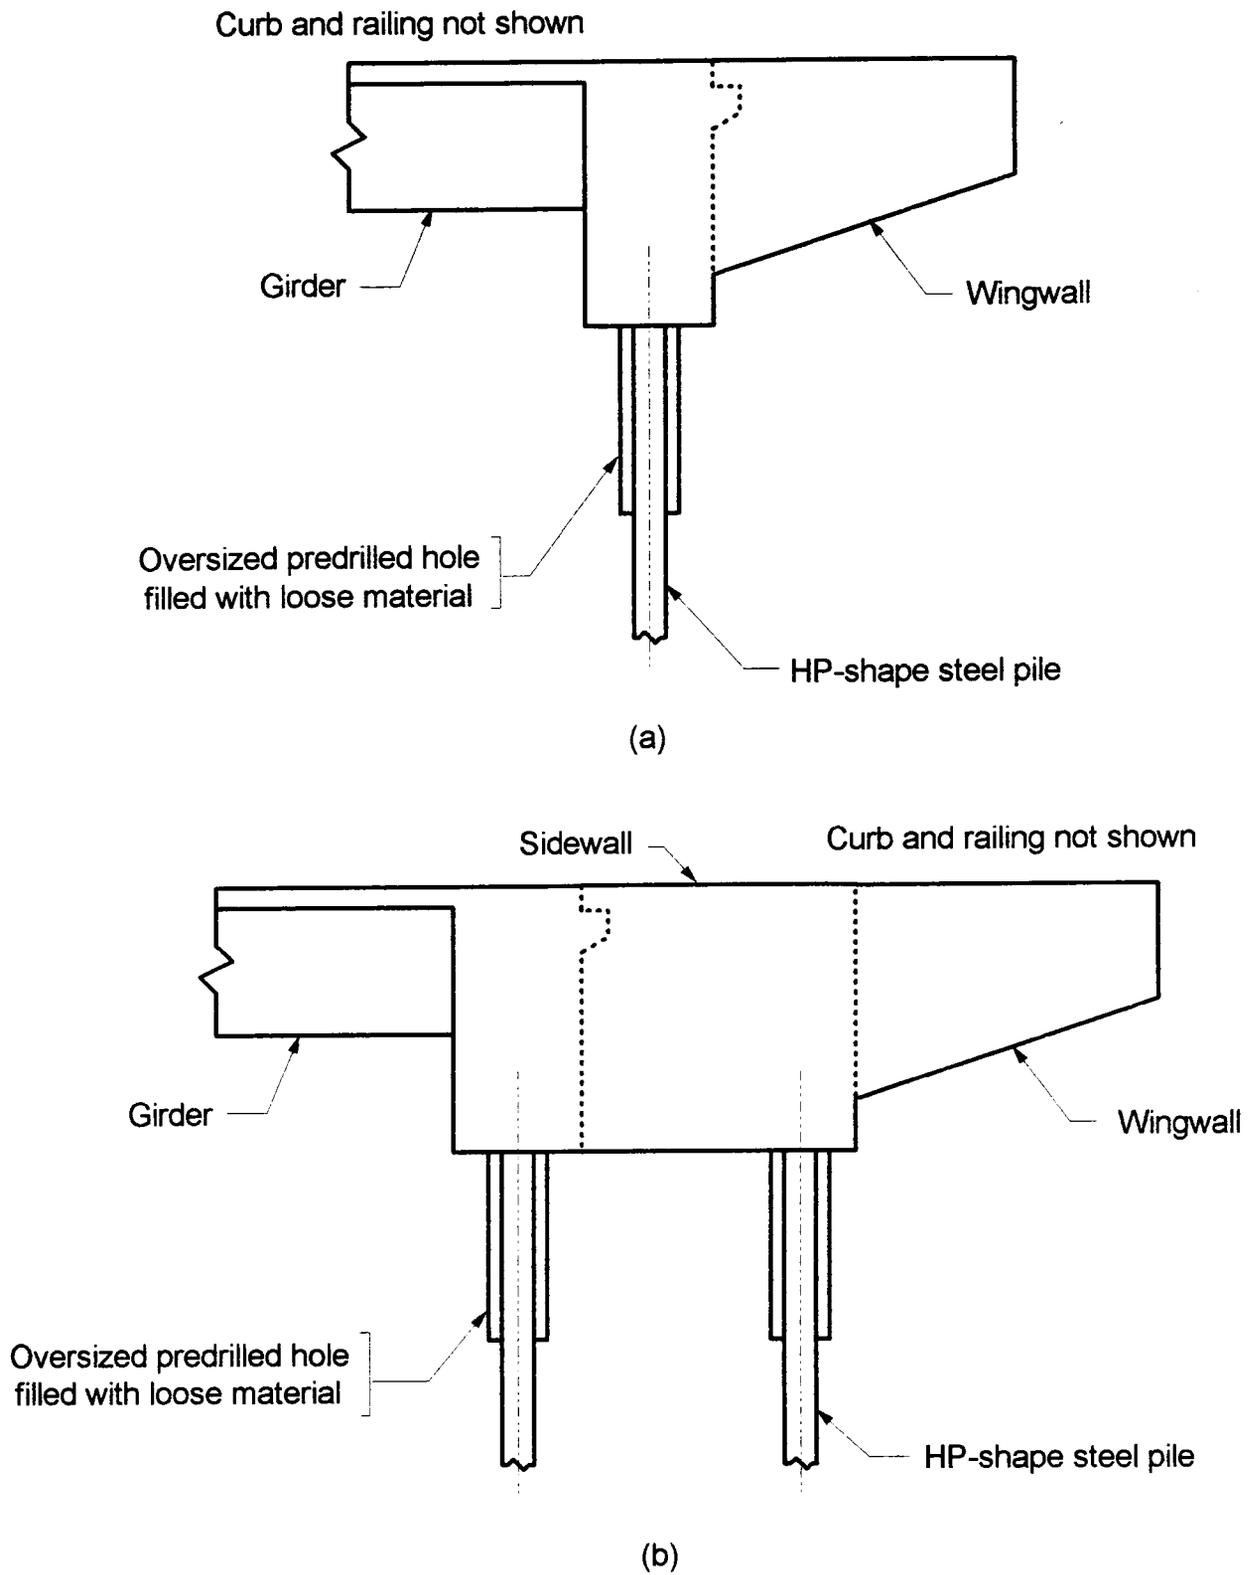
Integral abutment end view: (a) lowa Type-A, B, or C PC girders, (b) lowa Type-D PC girders.
